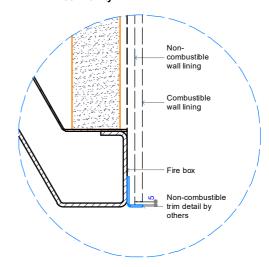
Cross Section Fire Surround Opt. 3 Timber Cavity
